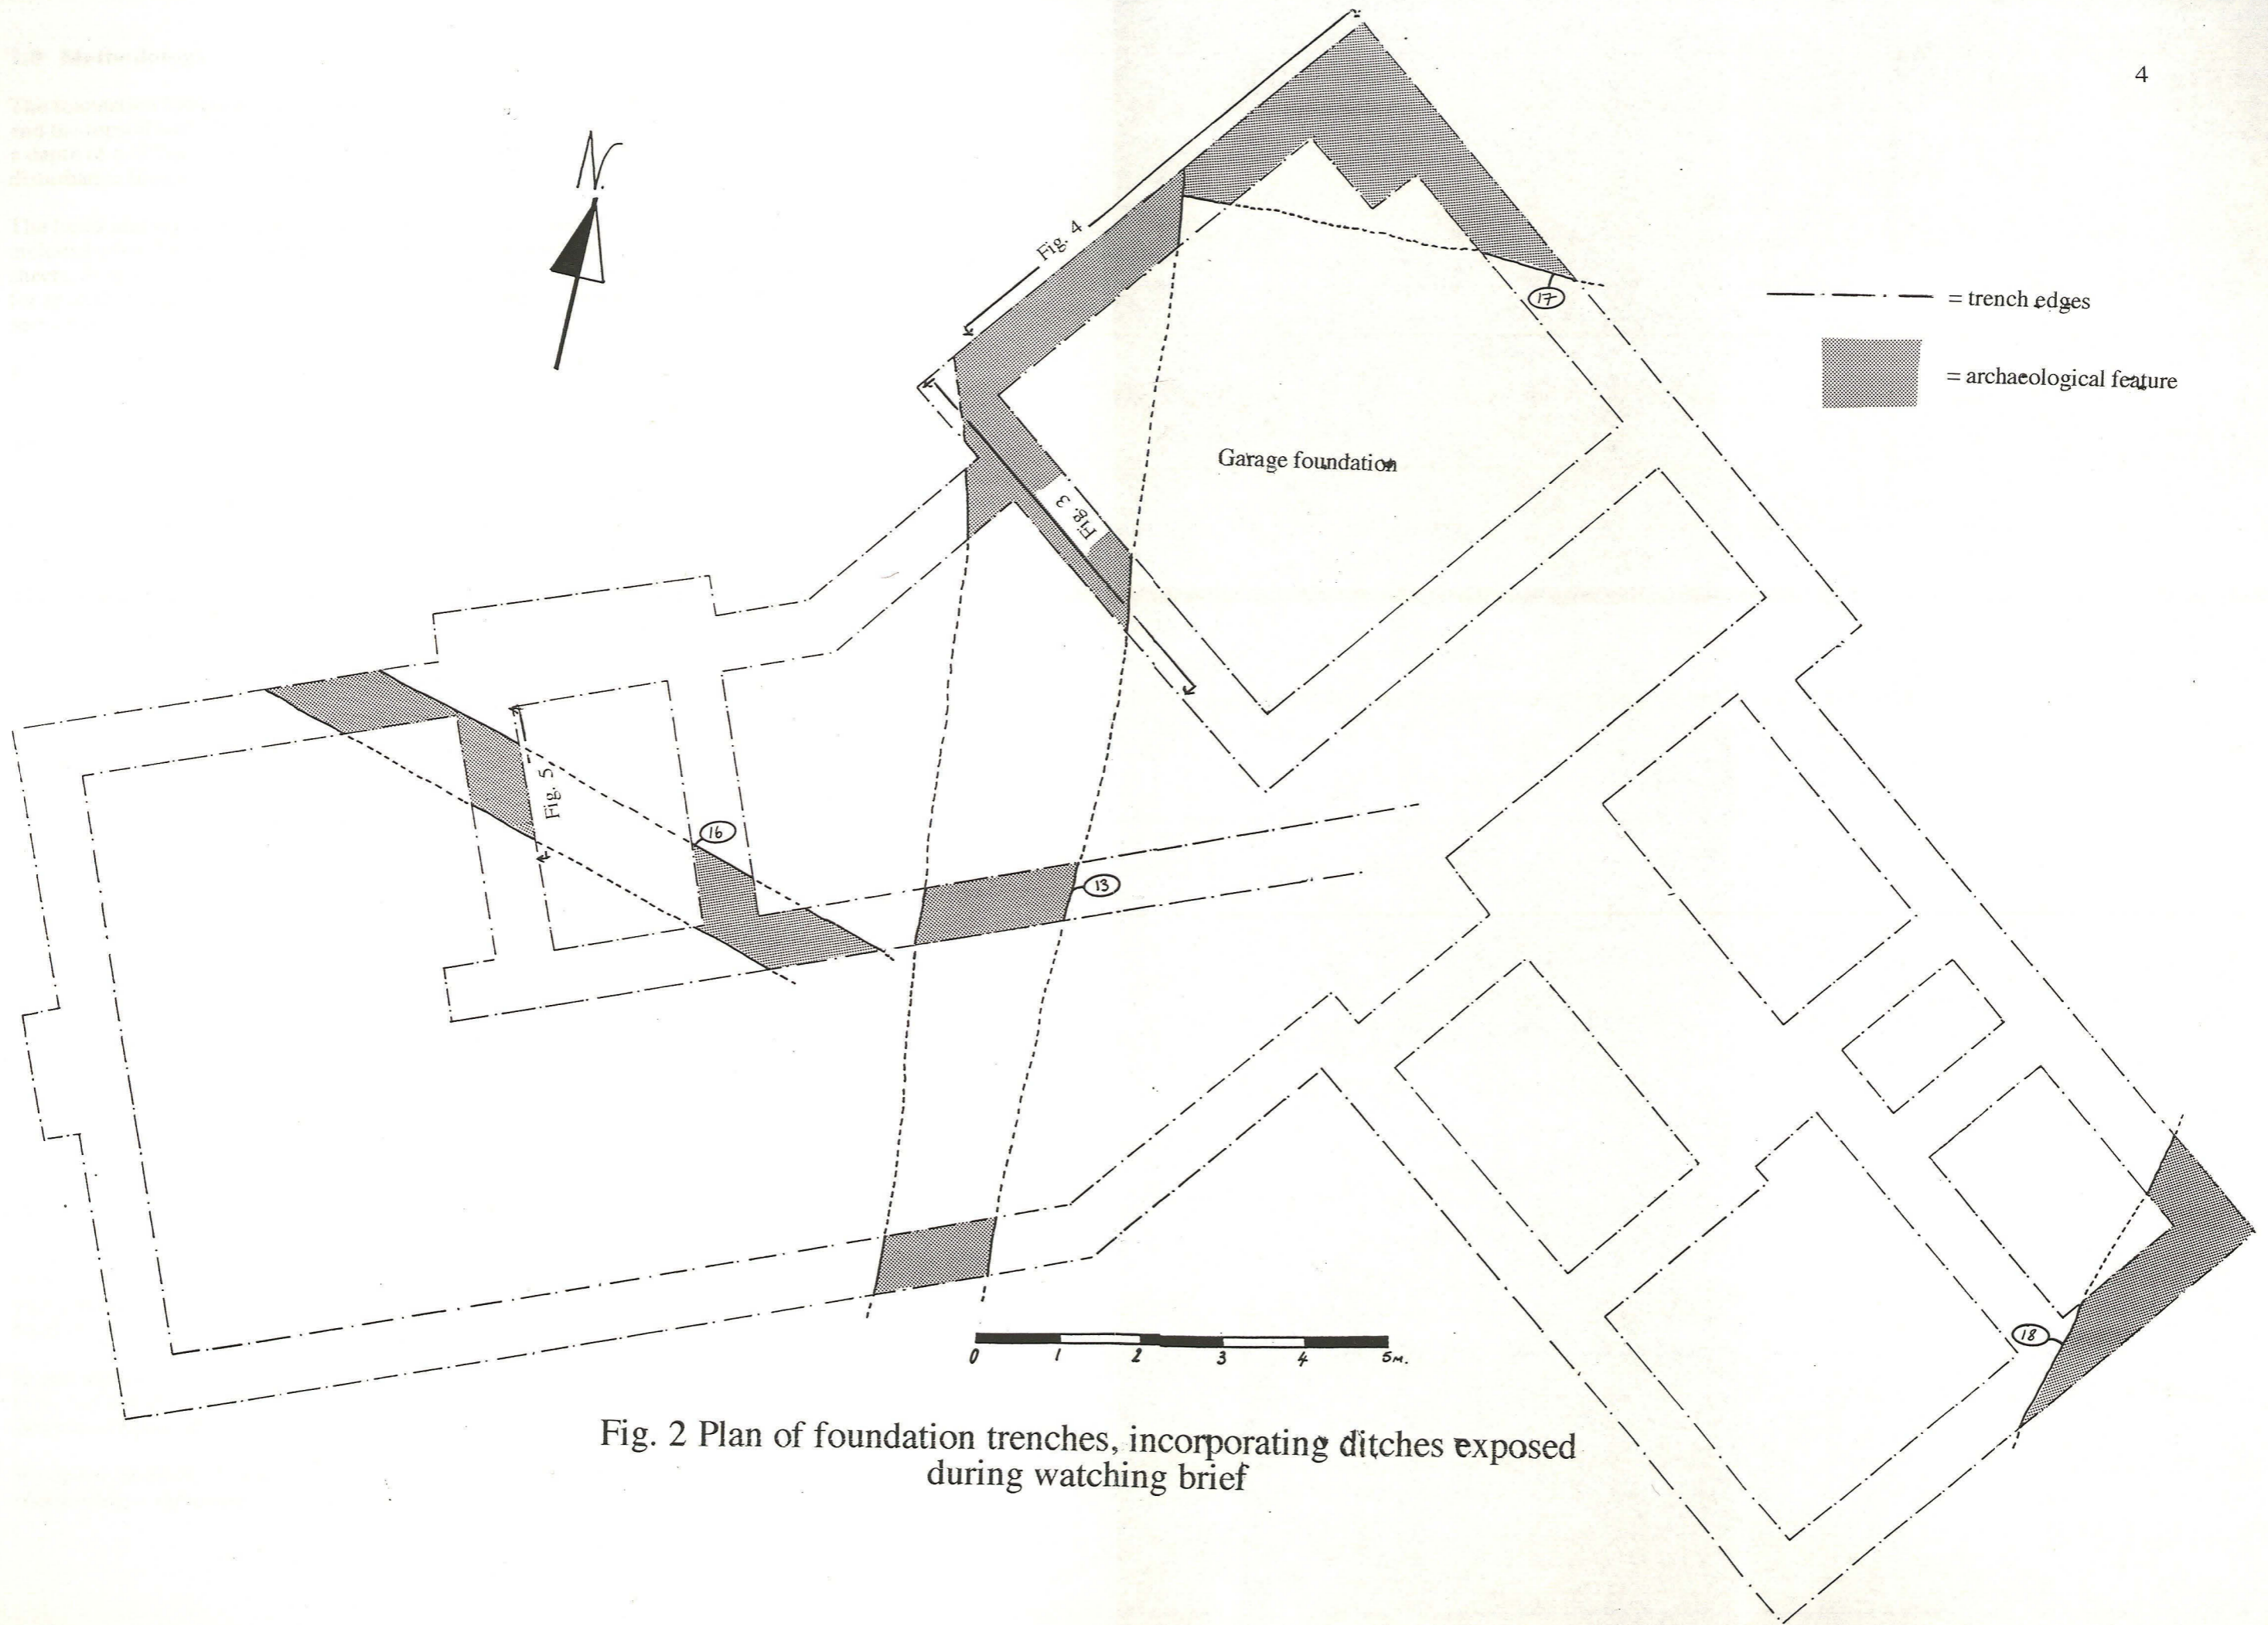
Plan of foundation trenches, incorporating ditches exposed during watching brief
